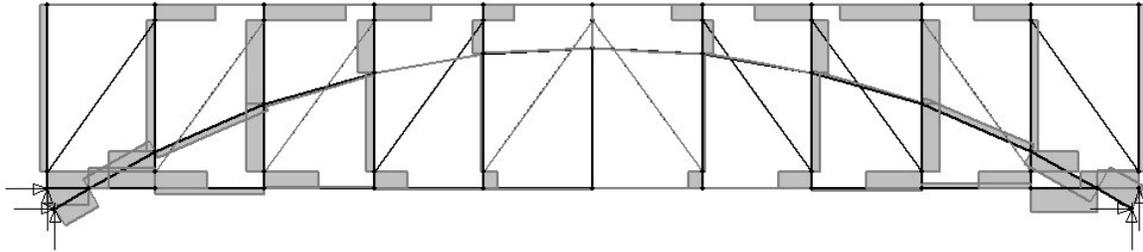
Shear Forces in Arch-Truss due to Dead Load.
